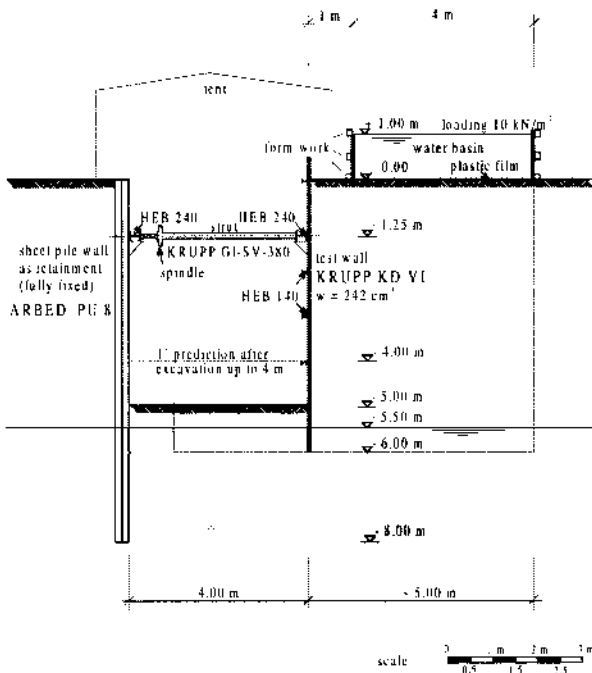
The construction excavation for the Sheet pile-wall test at Hochstetten (near Karlsruhe, Germany)
